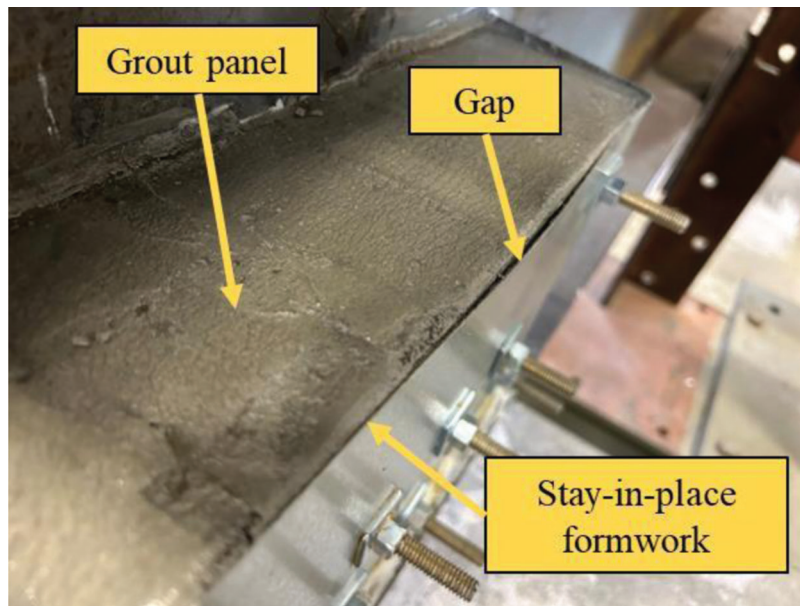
Specimen 3: detachment of stay-in-place formwork from grout panel.
